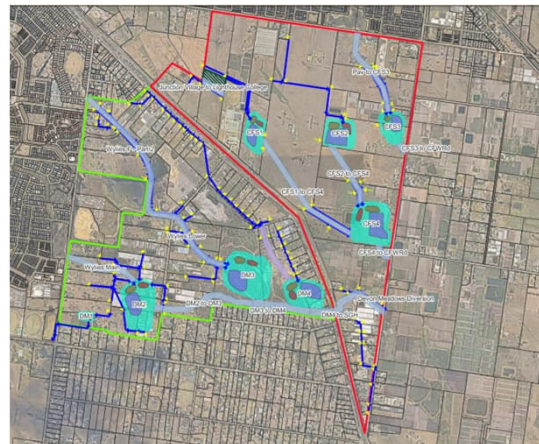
Preliminary Concept Drainage Strategy Plan (Source: Draft CFS&DM DSS - GHD 2024)
